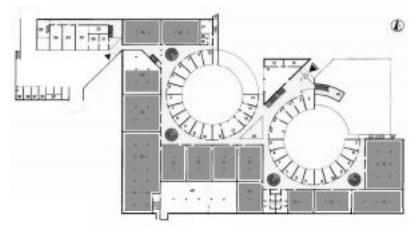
The first floor plan of ZSM. Storage rooms marked in grey, the arrow points out the main entrance.
